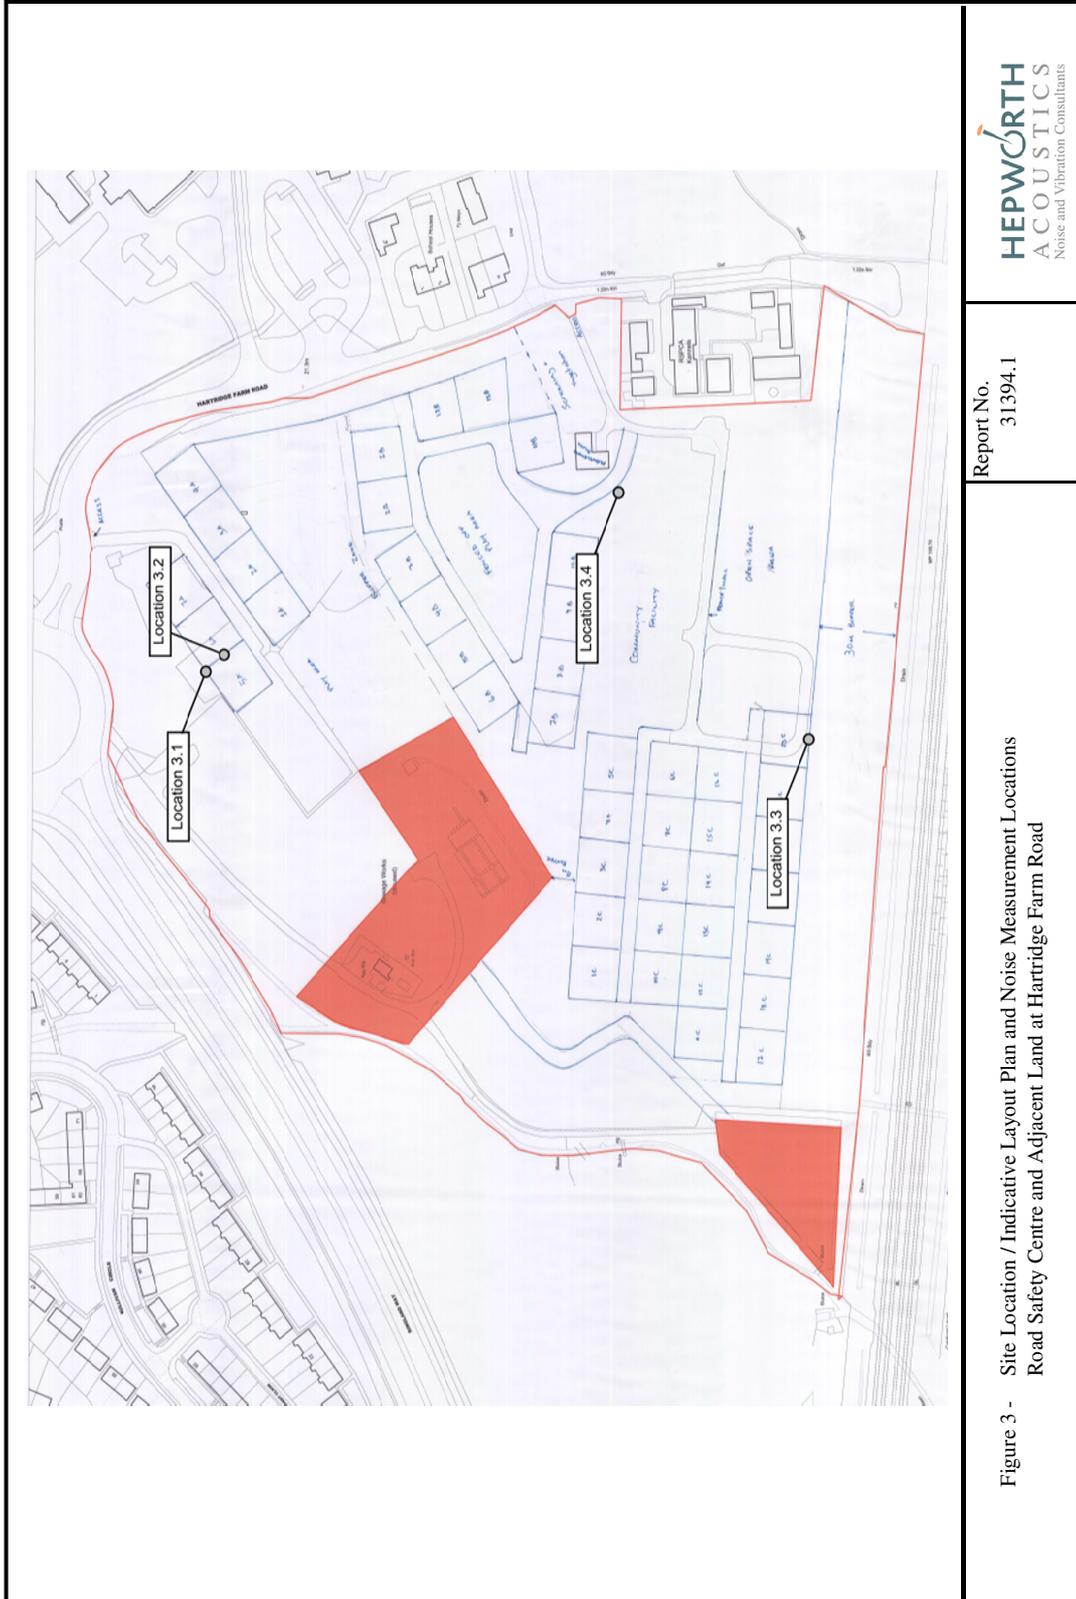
Site Location / Indicative Layout Plan and Noise Measurement Locations
